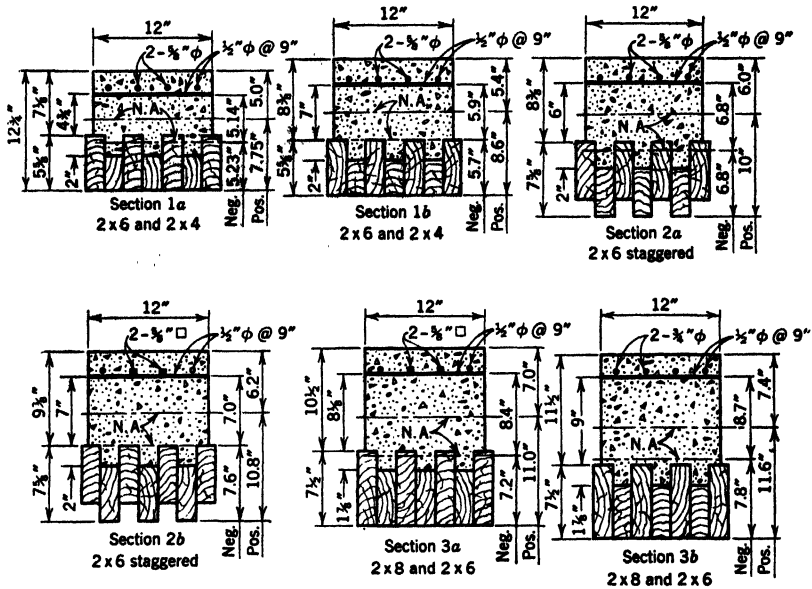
Arrangements of Timber, Concrete, and Reinforcing Steel.
